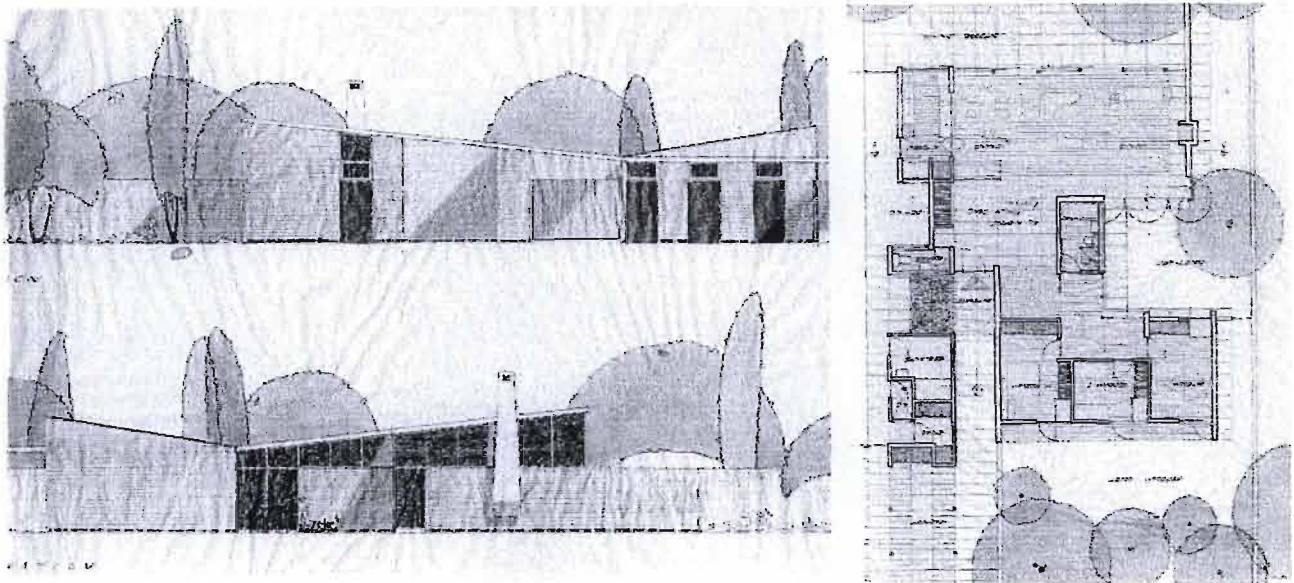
Bryan Lee – student project for a 'Courtyard House' 1961. Elevations and plan. Ref: Barrie Biermann Architectural Library.
